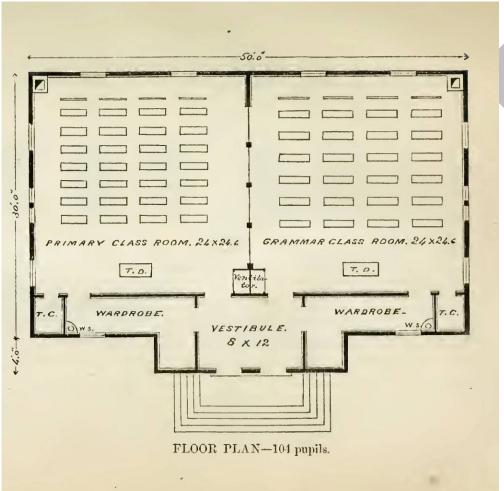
Floor plan of a two-room schoolhouse similar to Lafayette School.⁵
